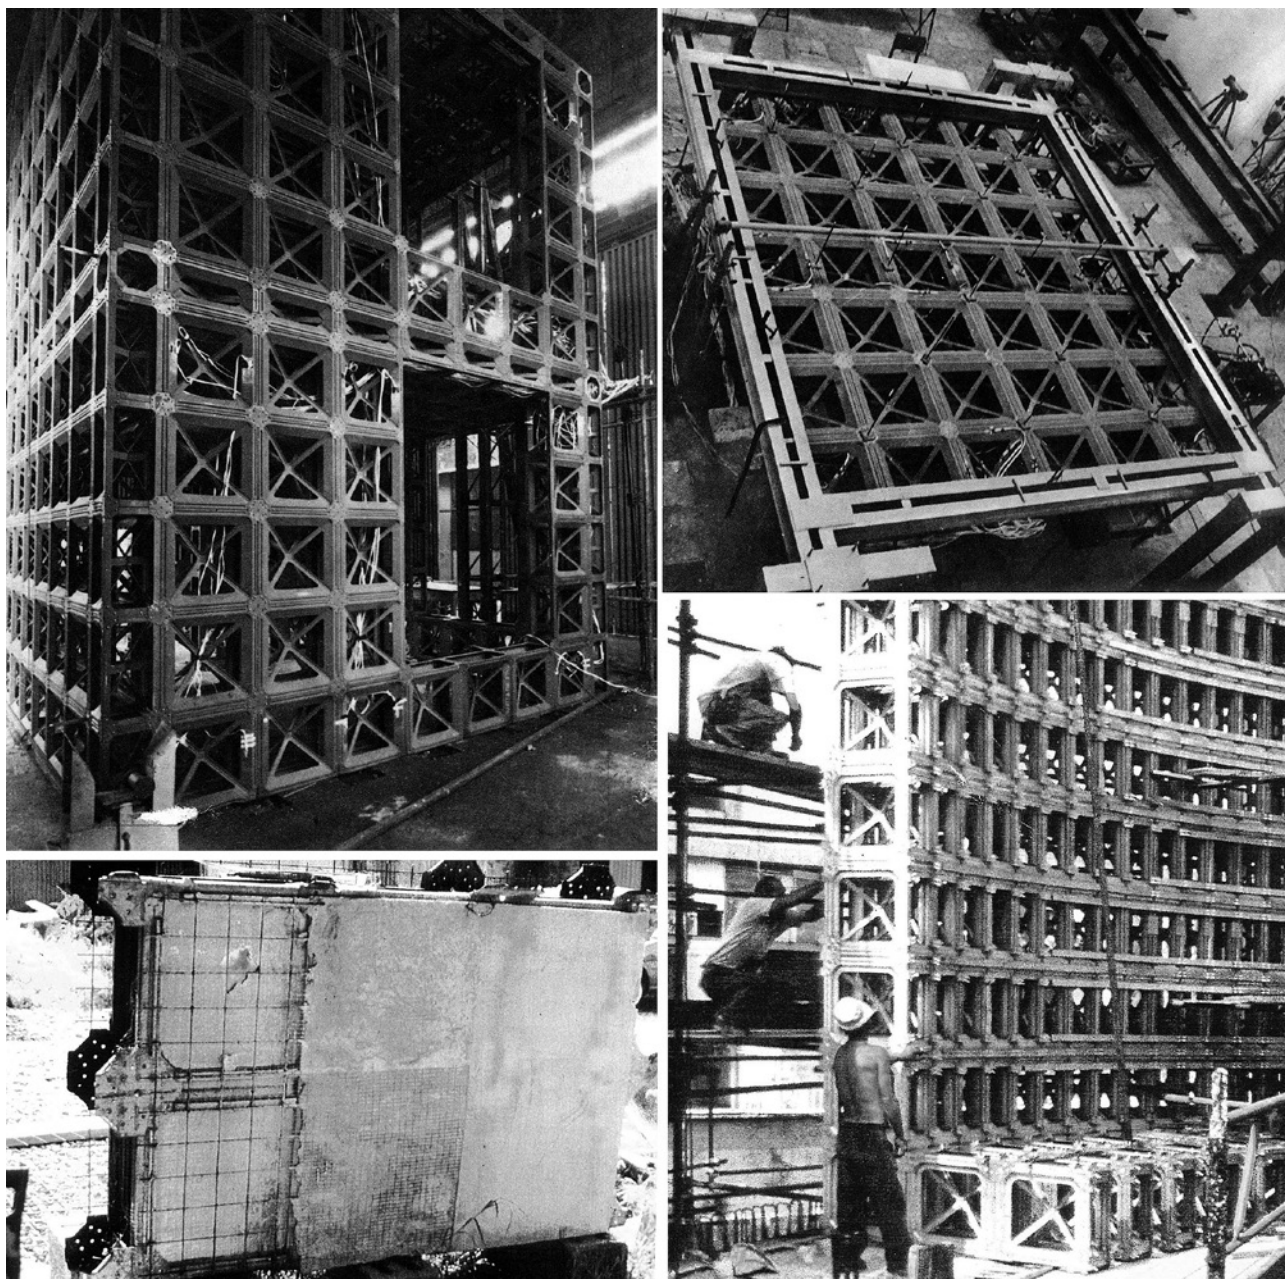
The steel brick developed by Pagano. Top left and right: the walls and slabs composed of steel bricks and tested in the laboratory of CESUN center. Bottom: a curved wall made of steel bricks and the mock-up of the wall. Source: Archivio Michele Pagano.
